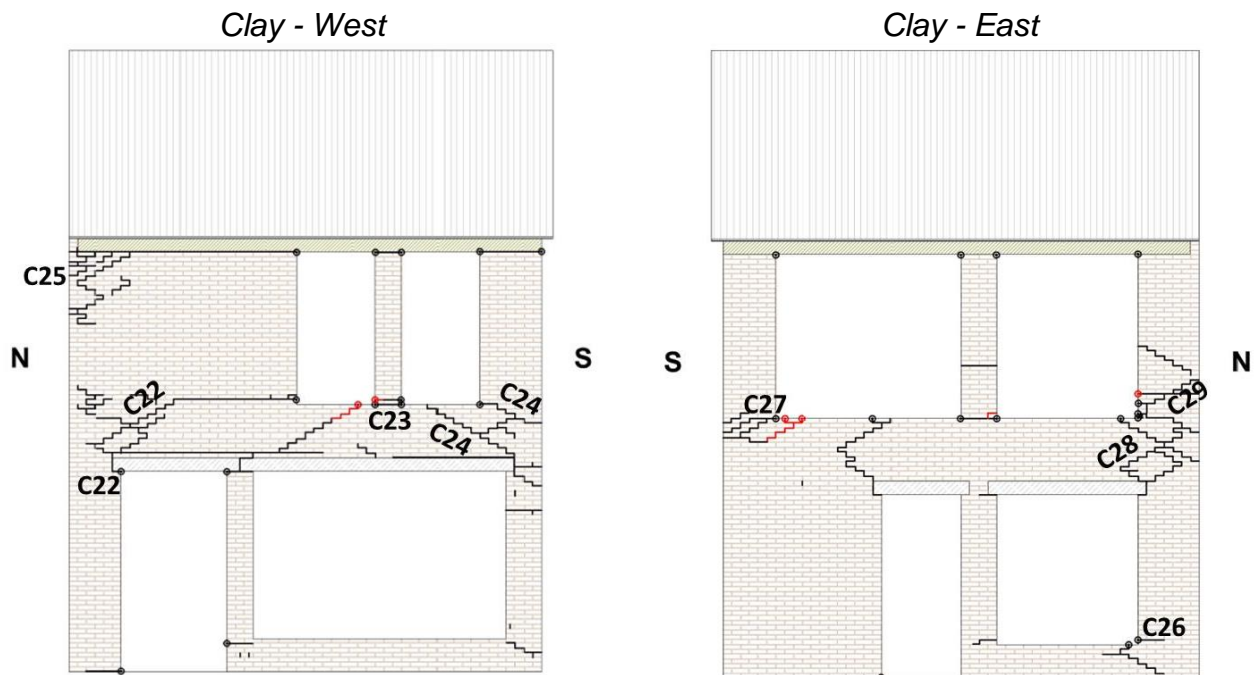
EQ-NPR IS 133% cracks - West and East clay façades.
